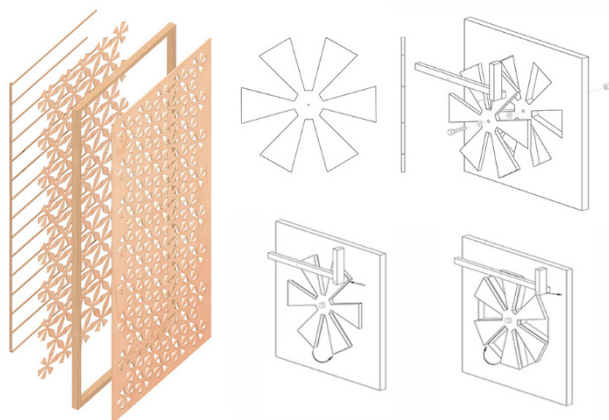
The Shutter prototype: exploded view of a single module and kinematic mechanism of each mobile dodecagon. [6]
